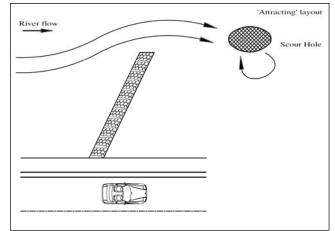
Plan view of attracting spur layout ^(8.9)
